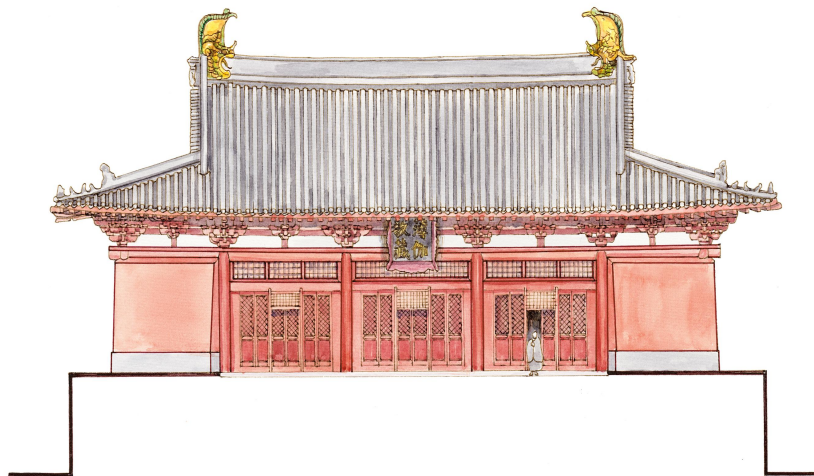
Front Elevation of the Bojia Buddhist Canon Hall
